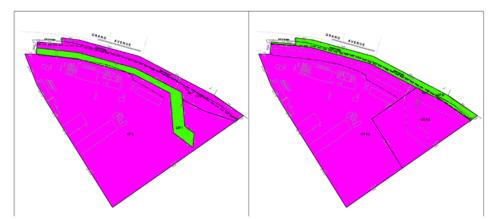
LEFT: Current site Layout RIGHT: Approved site layout under DA/671/2020
